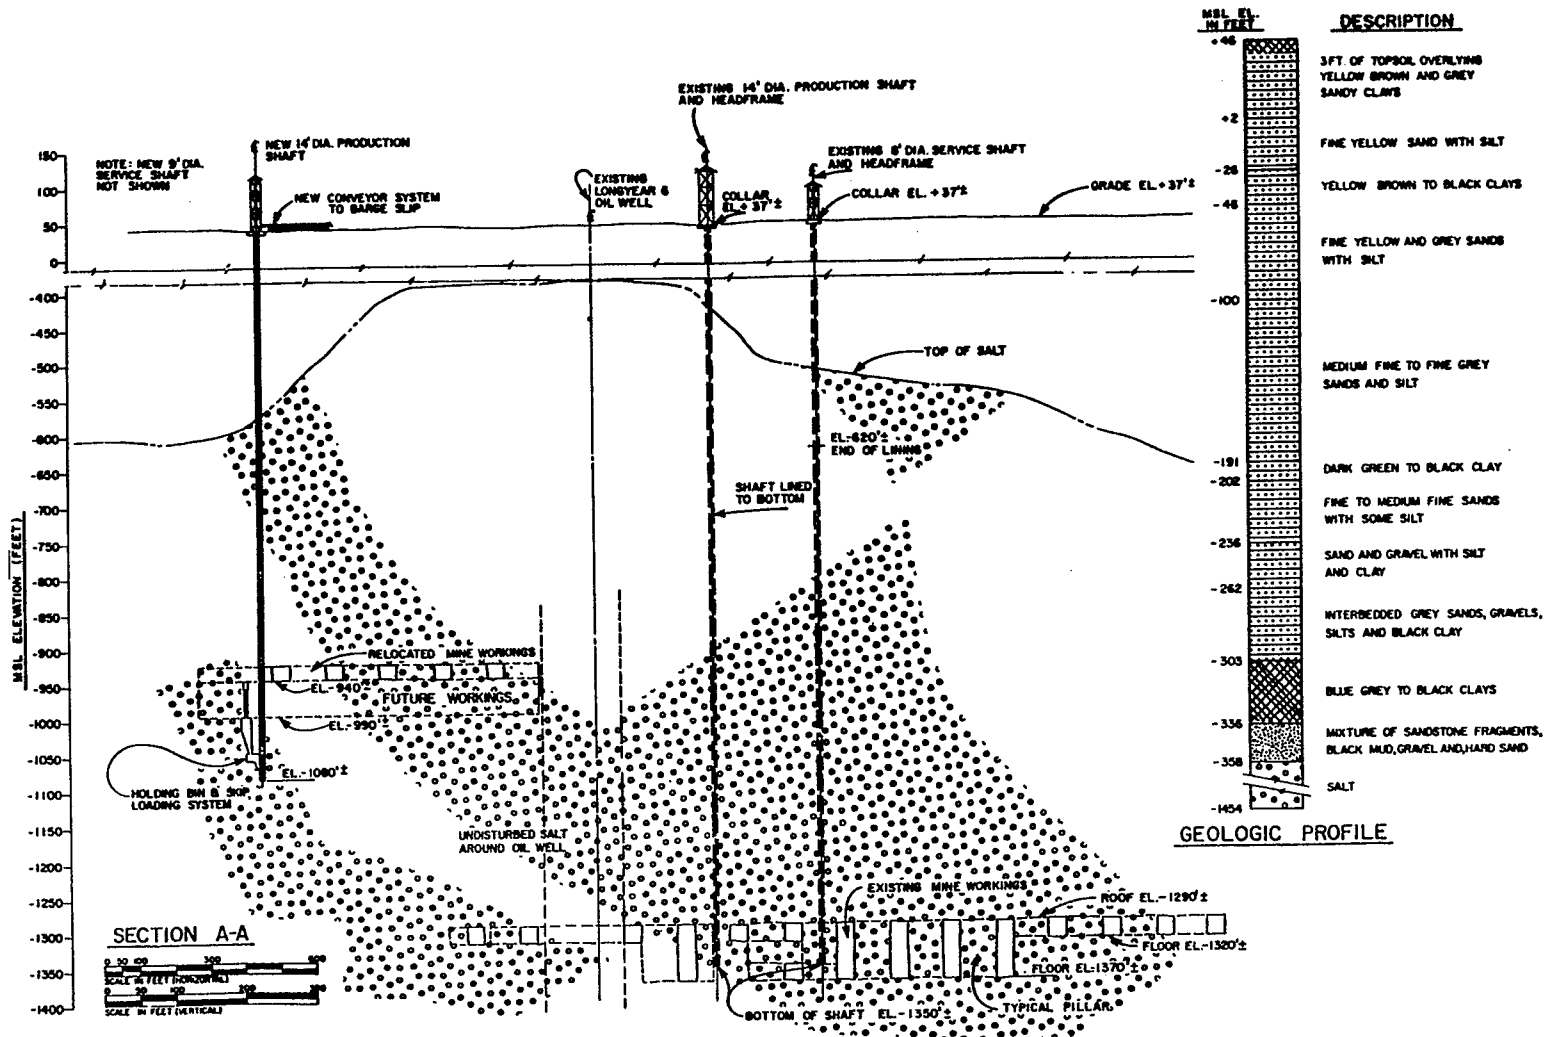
Sections and details Cote Blanche mine, Cote Blanche Island, Louisiana.
